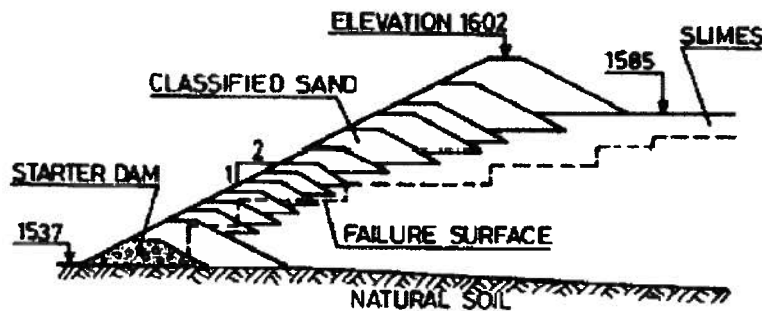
Cross section of the Barahona tailings dam showing the failure surface (Troncoso et al. 1993). Elevations are marked in m.
